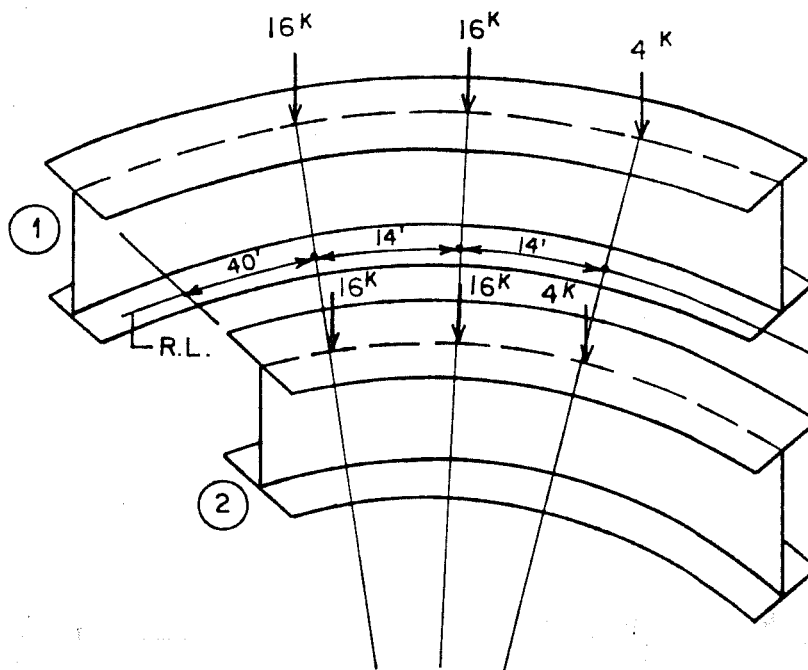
Location of wheel loads on two girder, simple-span bridge unit.
